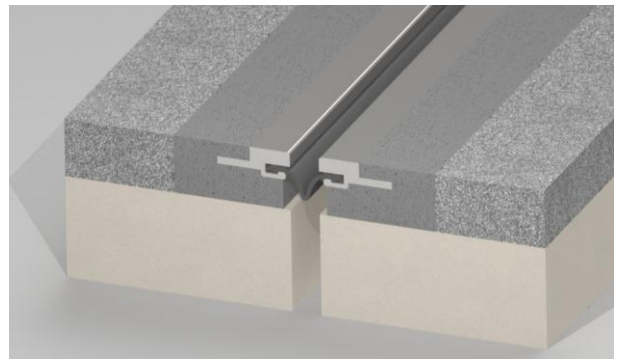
Single gap joint with anchorage in high-strength polymer concrete
